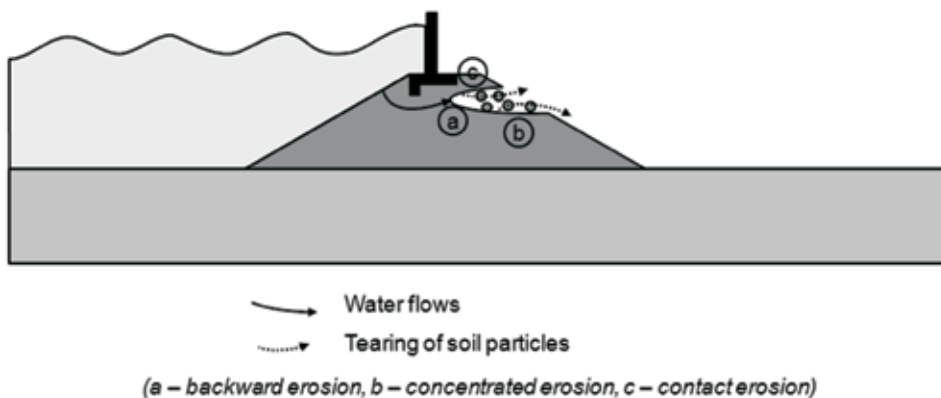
Internal erosion of foundation soils under a top wall (composite structure of levee) (courtesy Y Deniaud, CETMEF)
